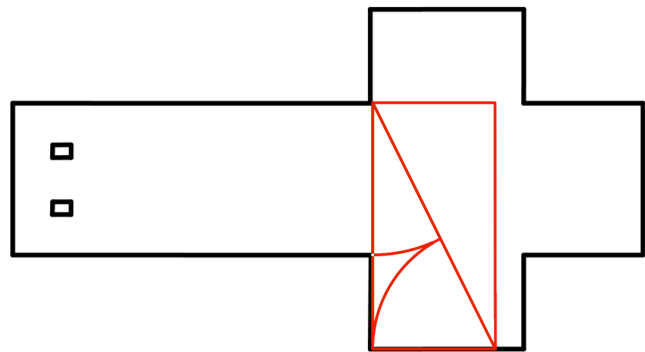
Geometric construction to verify golden ratio in Sta. Barbara Church floorplan.
